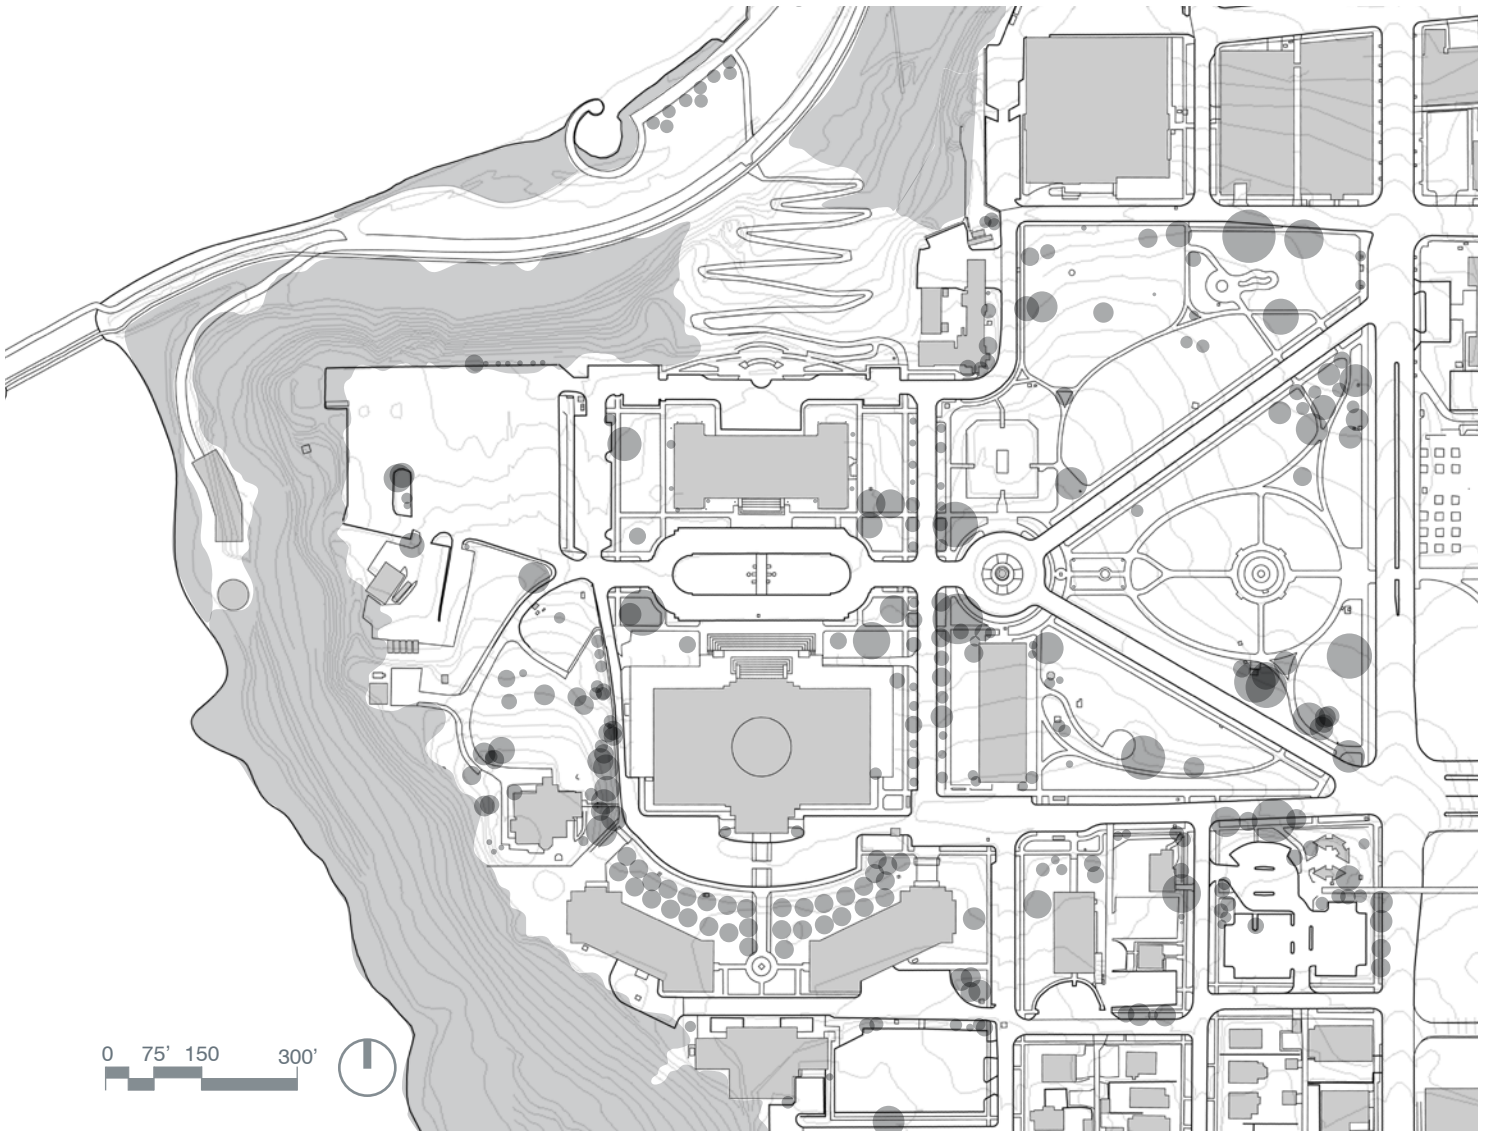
Existing Campus Base Plan overlain with existing trees.
